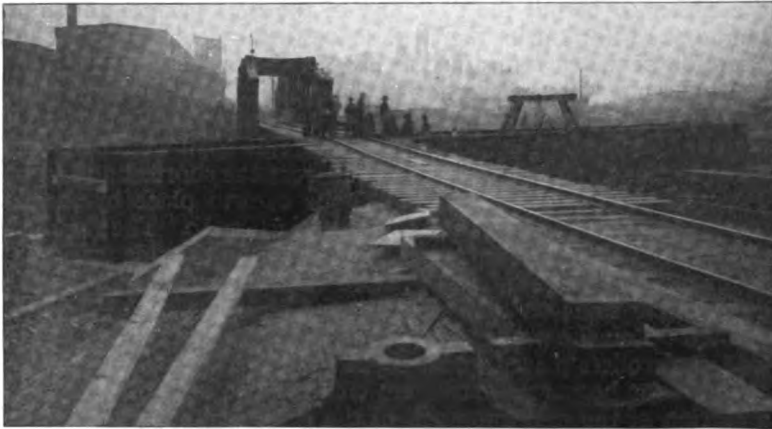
View Before Disturbing the Track at 4 P. M.--Looking West and North, Girder Bridge in Position as it was Built.
